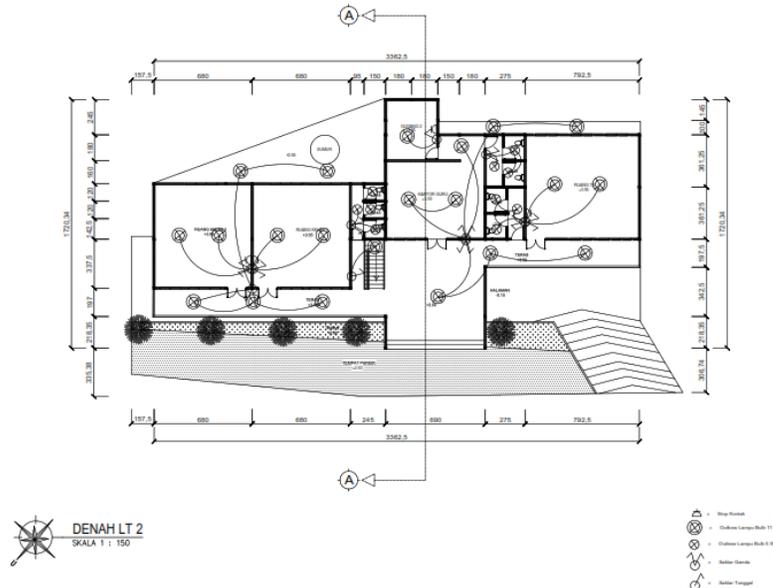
Light and socket installation design on the 2<sup>nd</sup> floor
